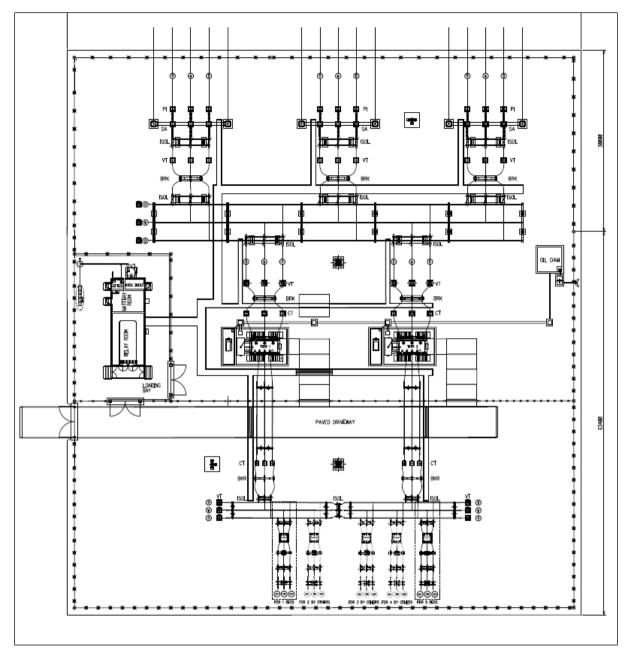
Typical Substation Layout (note: for illustration purposes only)
